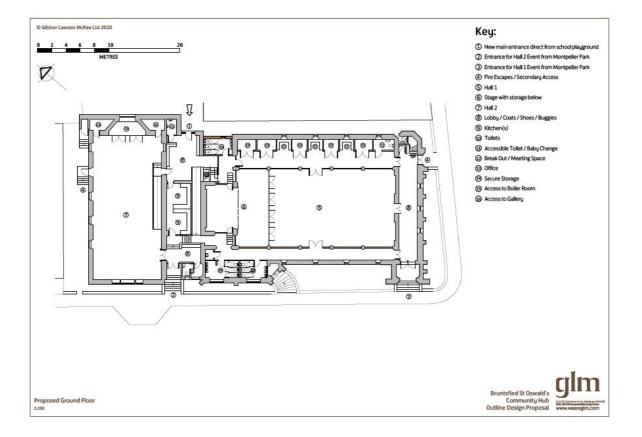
Proposed ground floor plan for St. Oswald's drawn up by GLM
